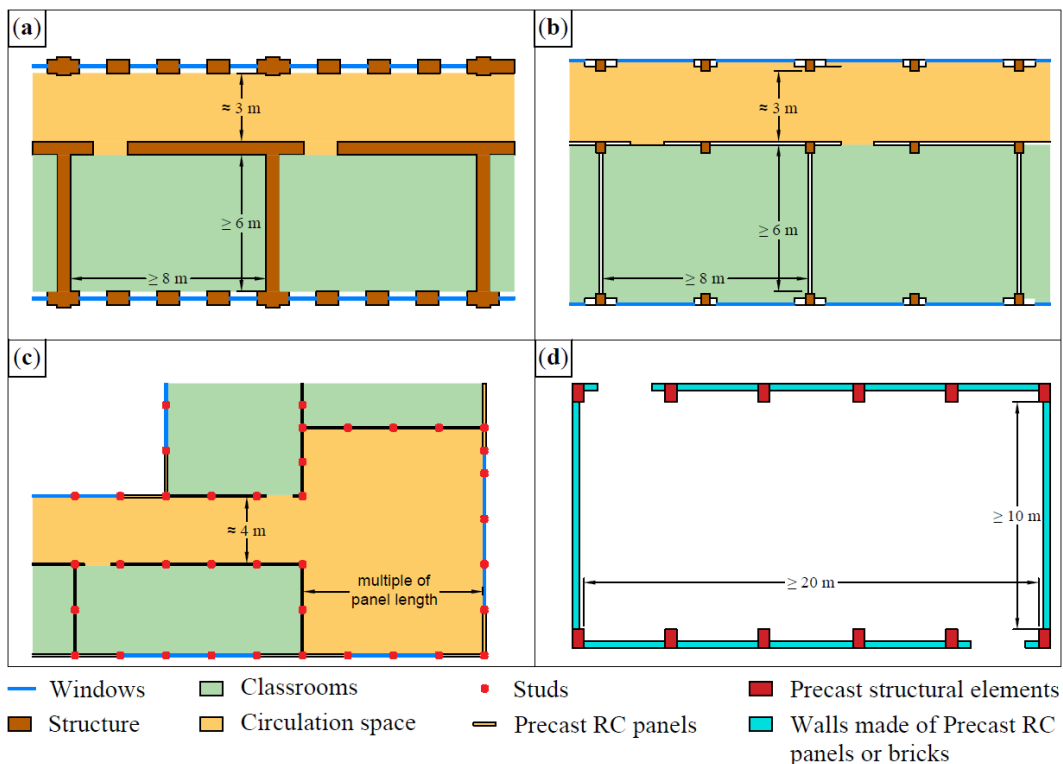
Typical structural layouts of: (a) masonry school; (b) RC frame school; (c) school made of precast concrete panels; (d) precast RC columns and beams.
